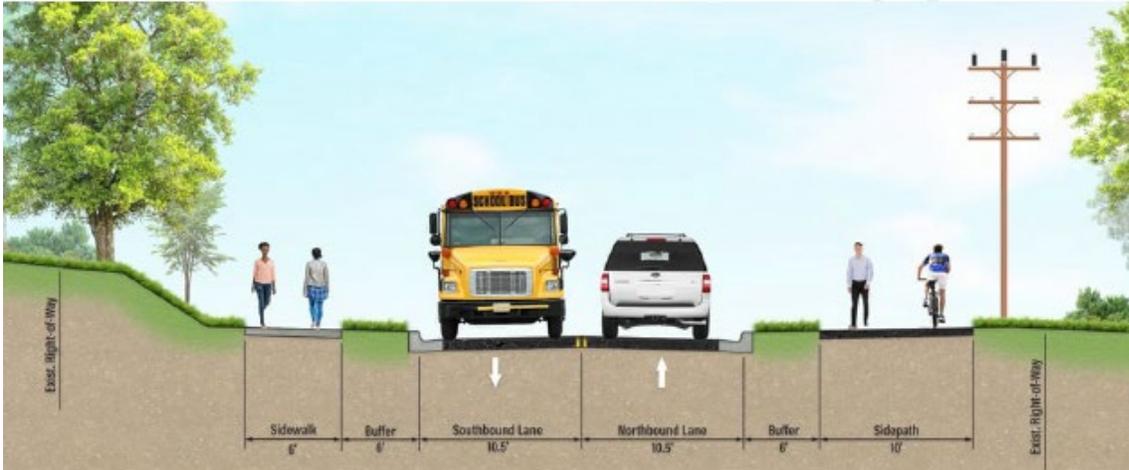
Alternative 2 - Old Columbia Pike Typical Cross Section
